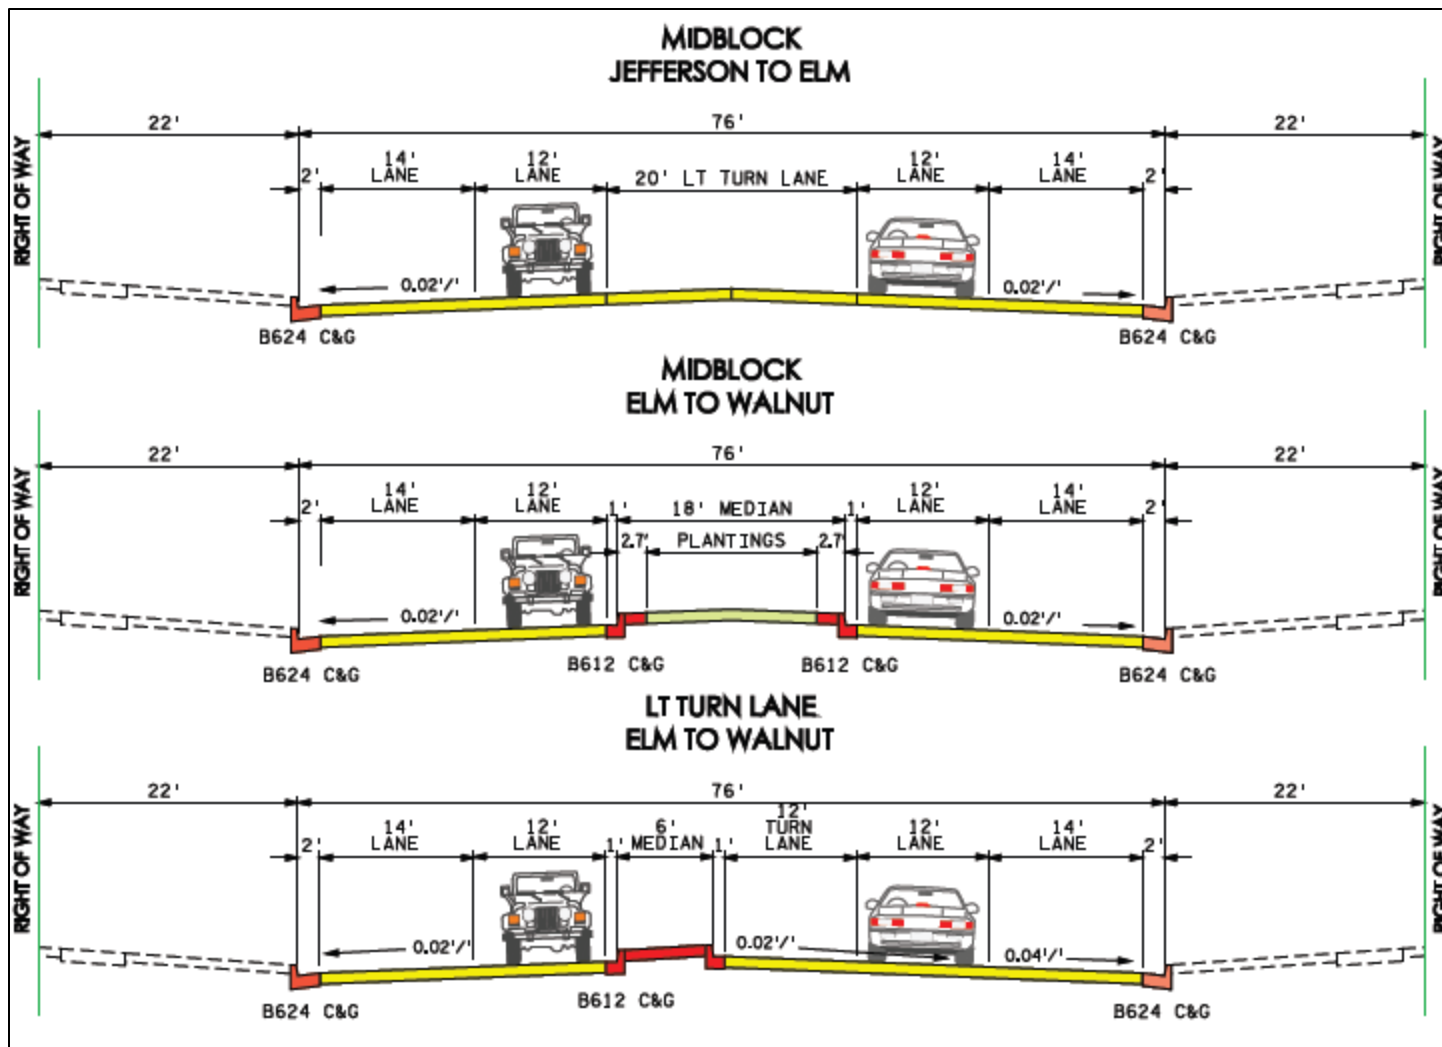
TH 169 Cross-Sections from Jefferson to Walnut After Reconstruction
